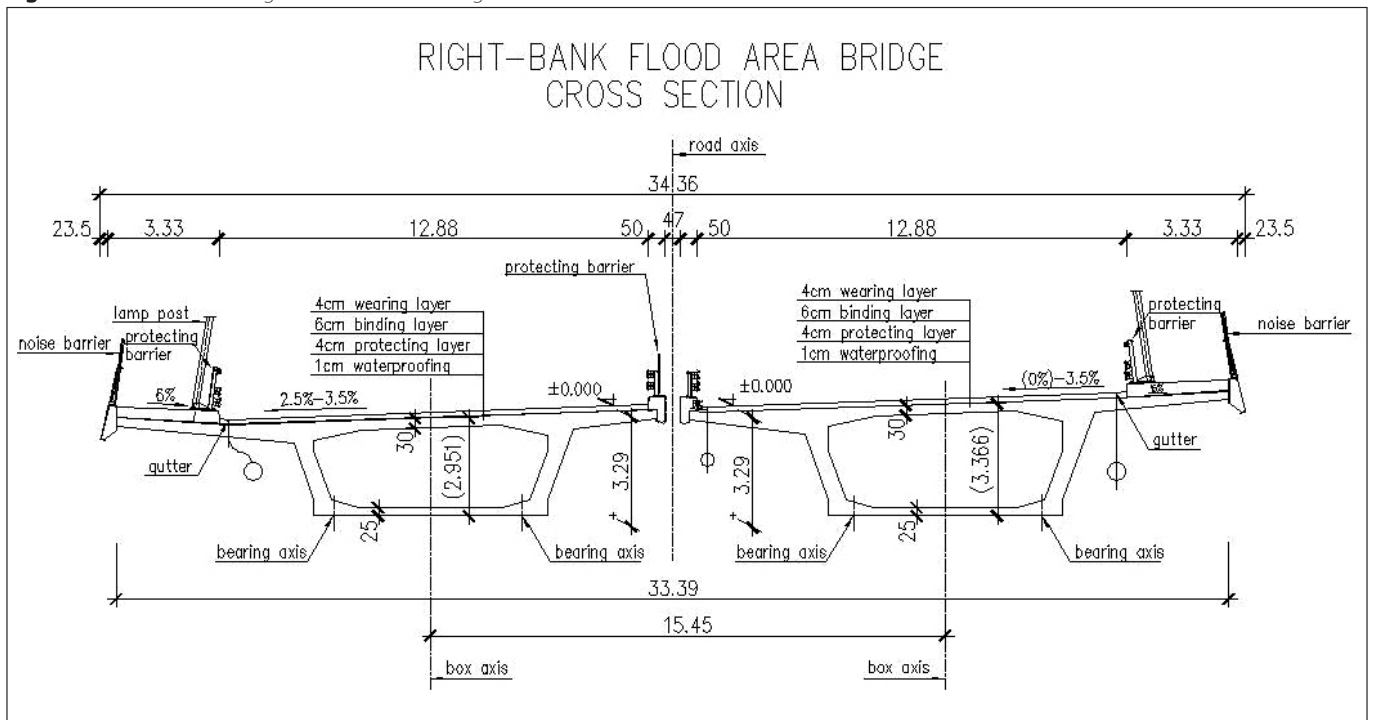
Cross-section of the construction unit (photo by: György Nyíró)
